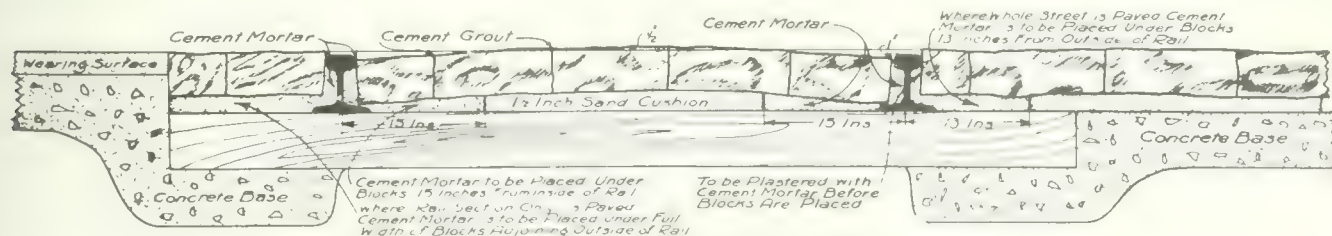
Detail of Rail Section for Granite Block Pavement.
